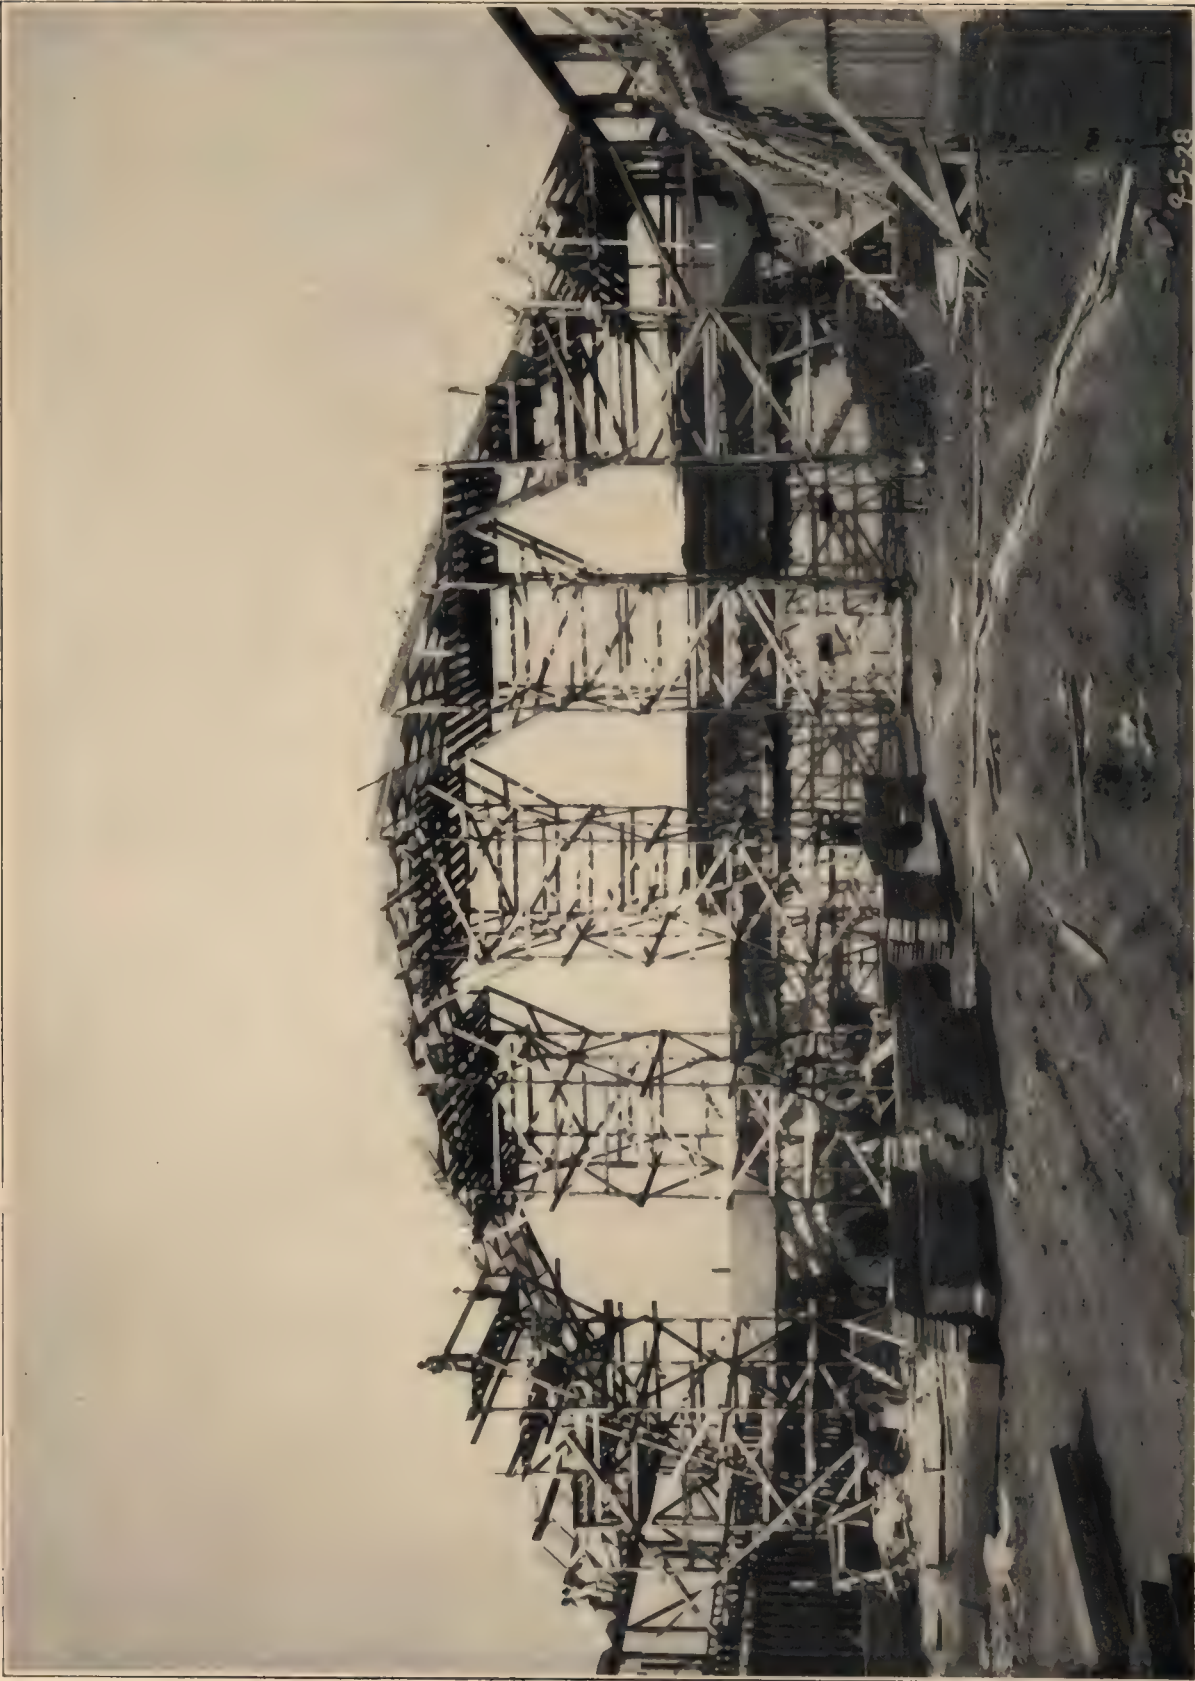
Skating Arena at Fort Erie, Ontario, under construction—138 feet x 210 feet. Spring line 27 feet, rise of arch 23 feet 4 inches, lamellas 3 inches x 16 inches by 13 feet. Note that one bay of lamellas has been completed and scaffold moved to the next bay which has just been started at both sides.
